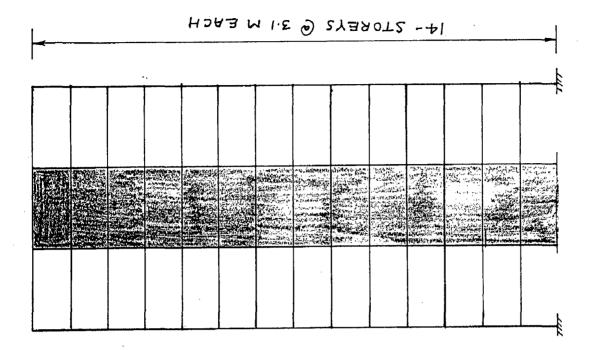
Steel bracing patterns used in retrofitting for frame in x-direction
